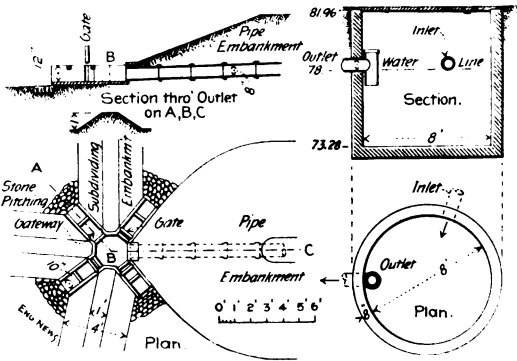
Plan and Section through Sewage Outlets and Cesspool.
